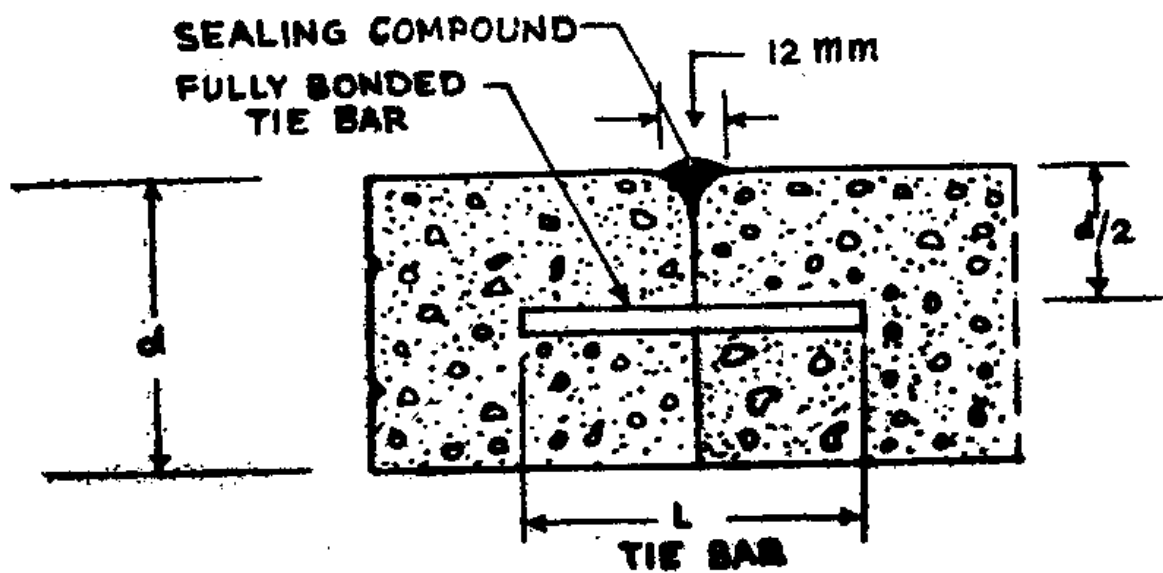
Butt joint with tie bar (for longitudinal warping joint)
